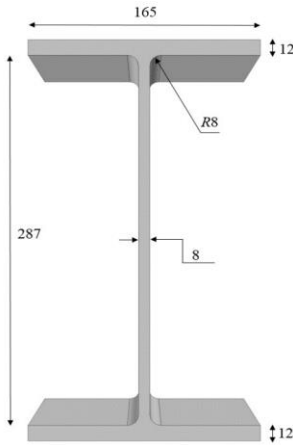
THE CROSS-SECTION OF THE STEEL I-BEAM (ALL DIMENSIONS ARE IN MM).
